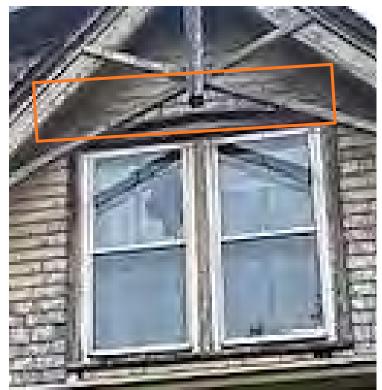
Red Gables second storey windows on the east elevation, with shaped lintels outlined in orange
